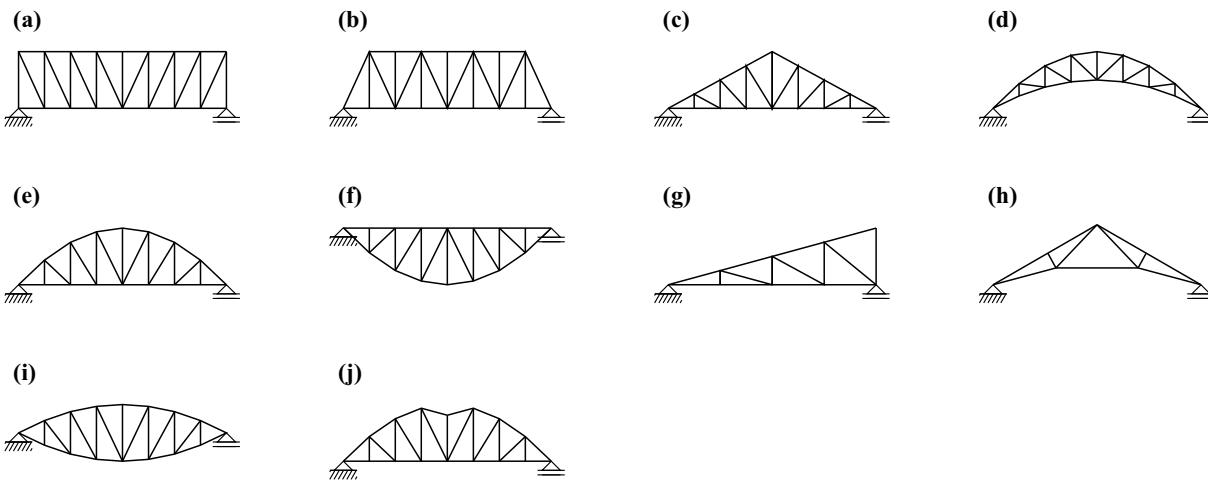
Types of truss: (a) PRATT truss, (b) modified WARREN truss, (c) duopitch PRATT truss, (d) crescent truss, (e) bowstring truss(PARKER truss), (f) inverted bowstring truss, (g) monopitch truss, (h) POLONCEAU truss, (i) PAULI truss (fish-belly truss), (j) SCHWEDLER truss
